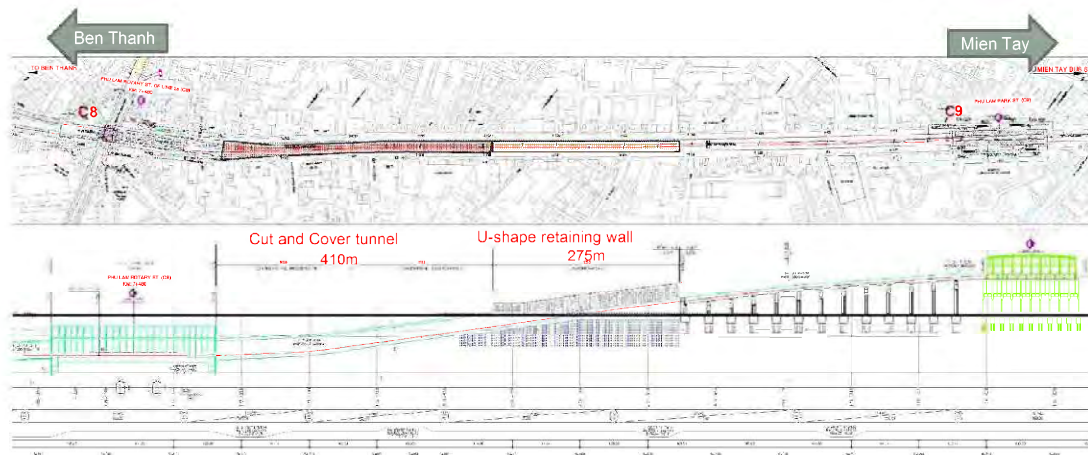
Plan and Profile between C8 and C9 Proposed by the JST
